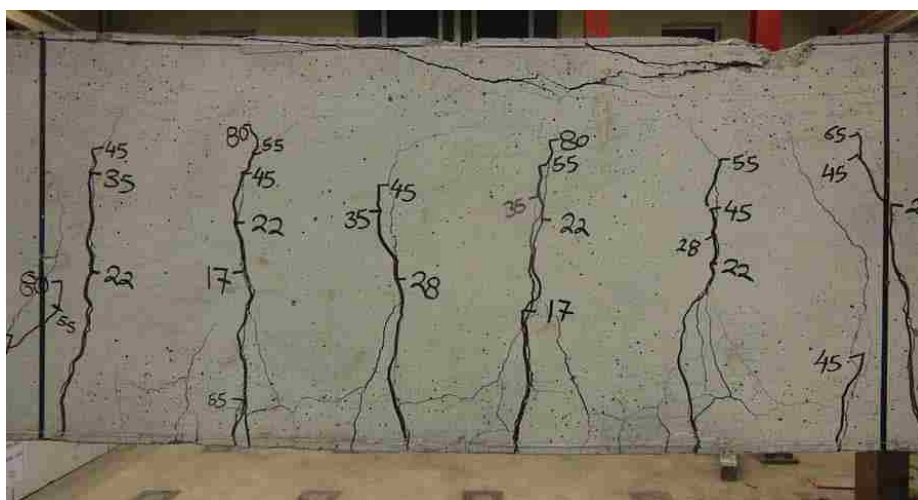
Crack Pattern of Specimen REF-60 (Side View)
